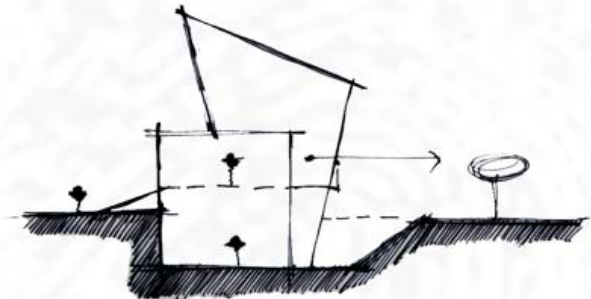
Typical Section E - Build Structure below ground level and excavate out section of ground for view lines.
